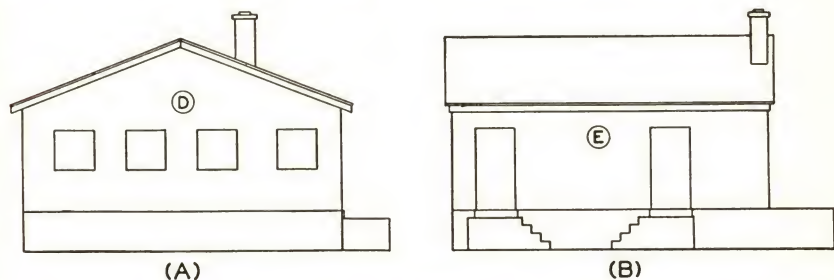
Elevation Views of Milkhouse Shown in Fig. 2
